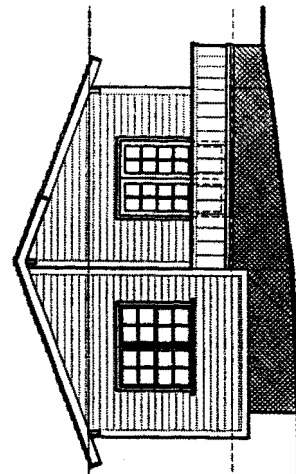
CDP 4-00-230 (Adler) Existing/Proposed Guest House/ Storage/Workshop/Garage
